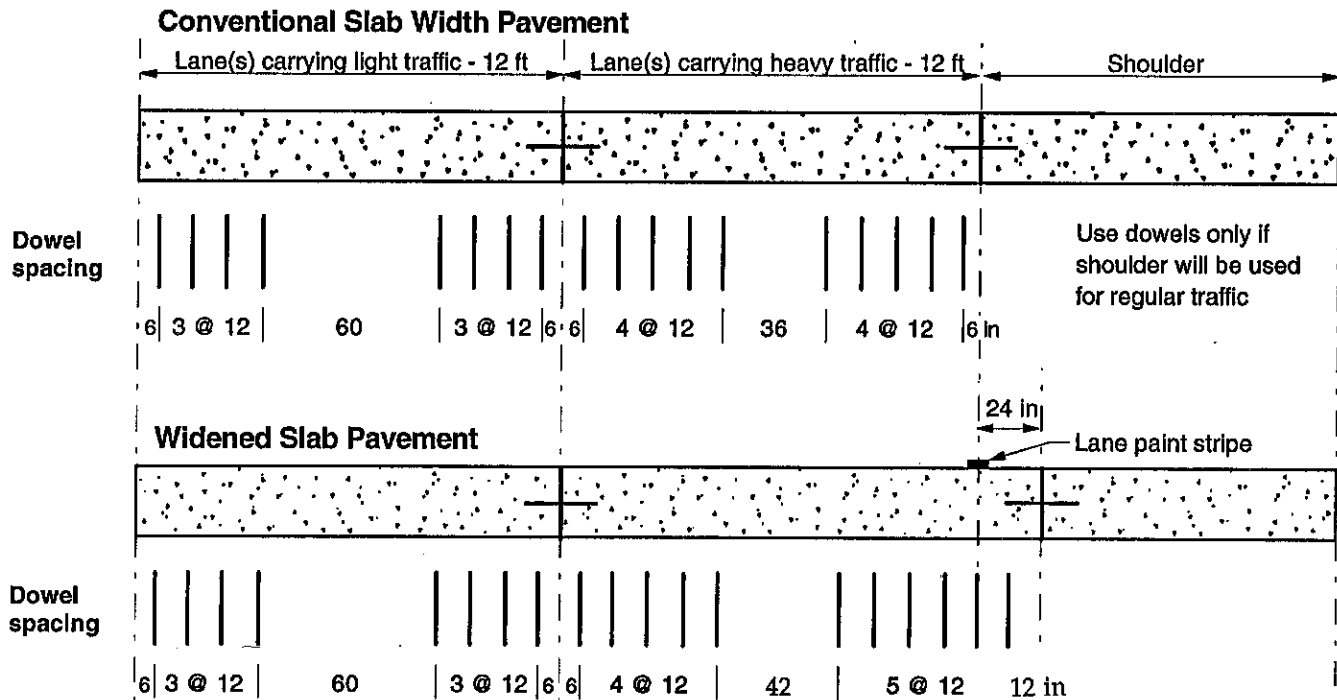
Recommended design for transverse contraction joints including the layout of dowel bars.
